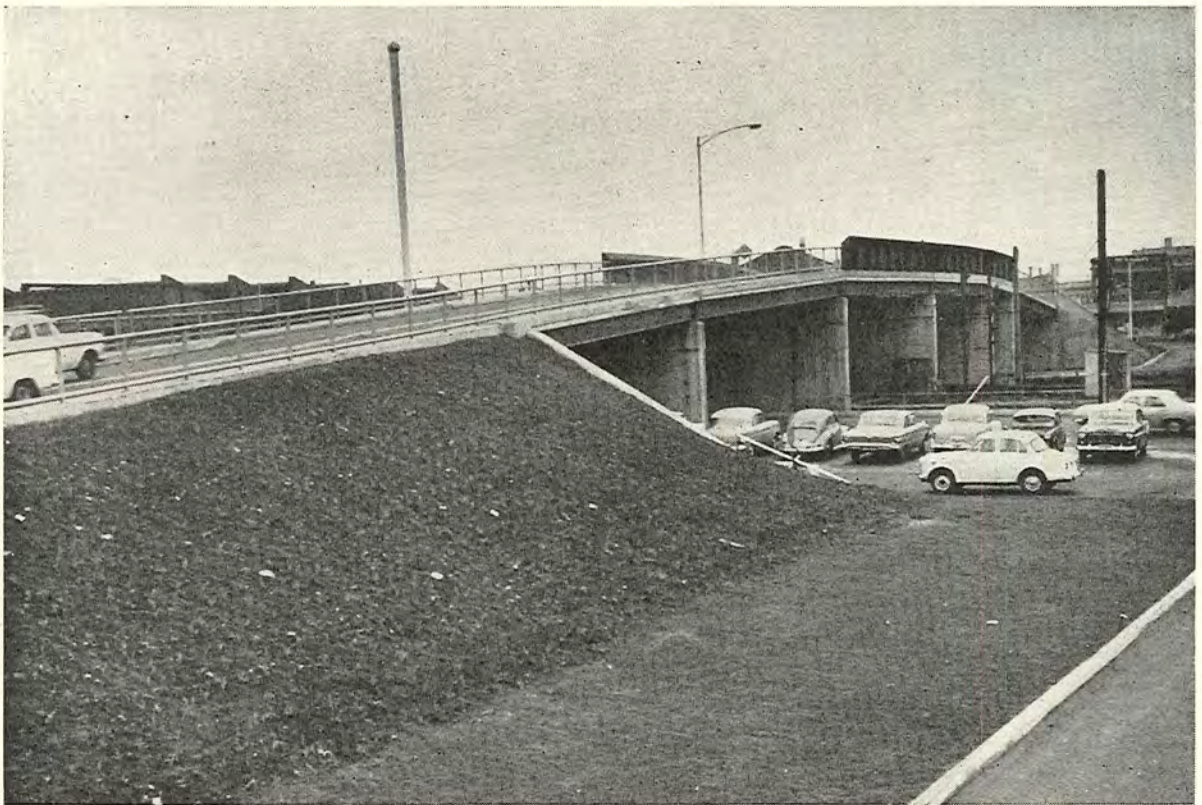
Road over Rail Overpass at Burnley Street—City of Richmond.
